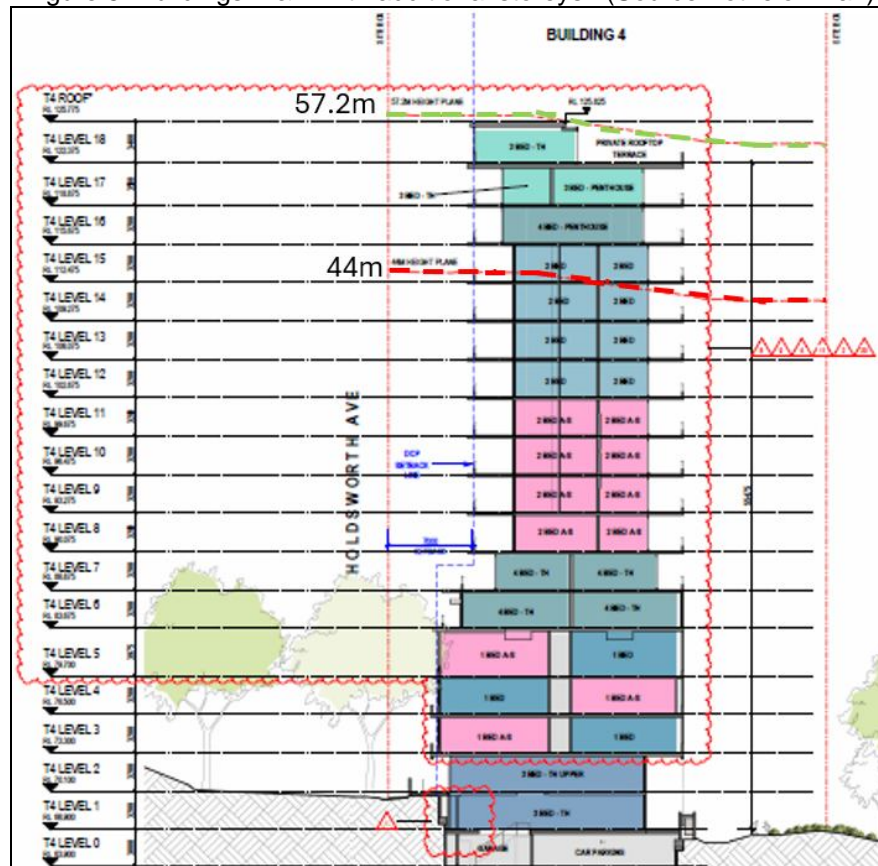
Building 4 with additional storeys. (Source: rothelowman)
